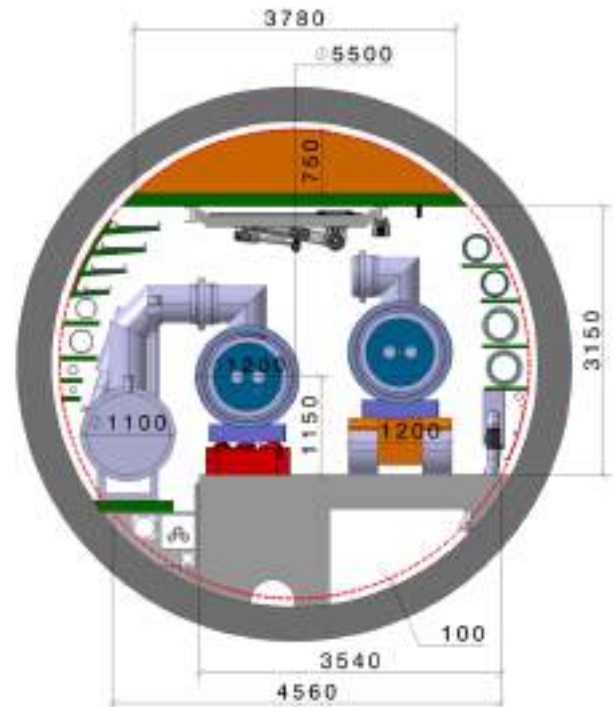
Cross section of the tunnel for the FCC-hh layout in the arcs
